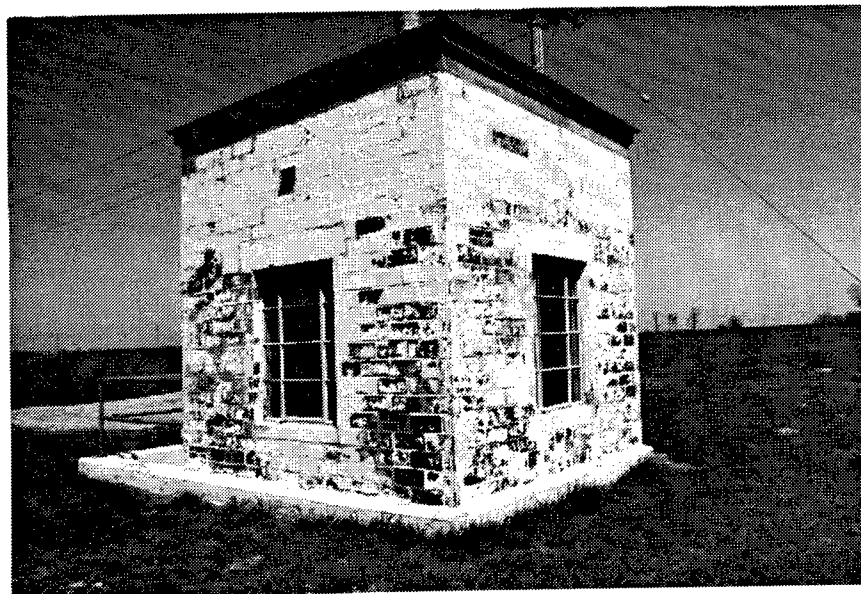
Building Number no longer known: Water Pump House which, at one time, supplied buildings in its general locale.
